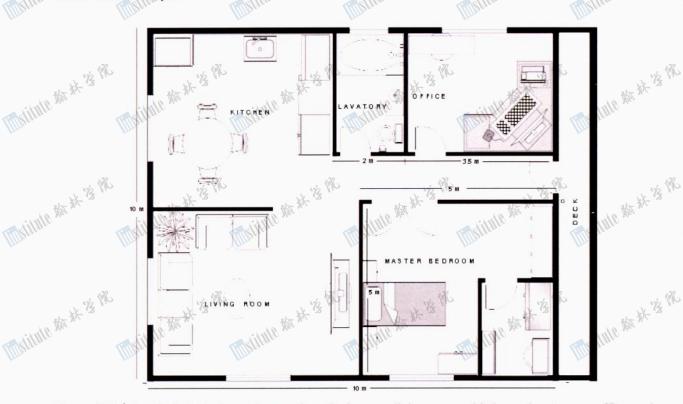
| A typical singles house has one large bedroom, a living room, a kitchen, a layatory, an office, and an Myithite Mark 13 outdoor deck. Area: 1076.4ft² (100m²).
